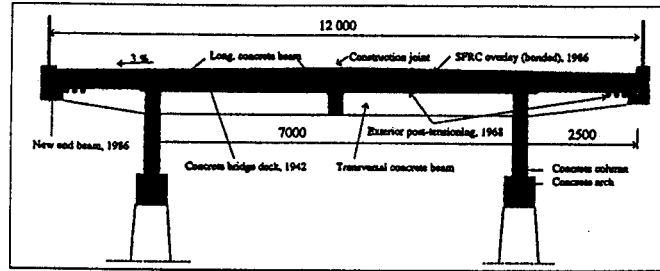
Cross-section of Overboda Bridge after repair in 1986
